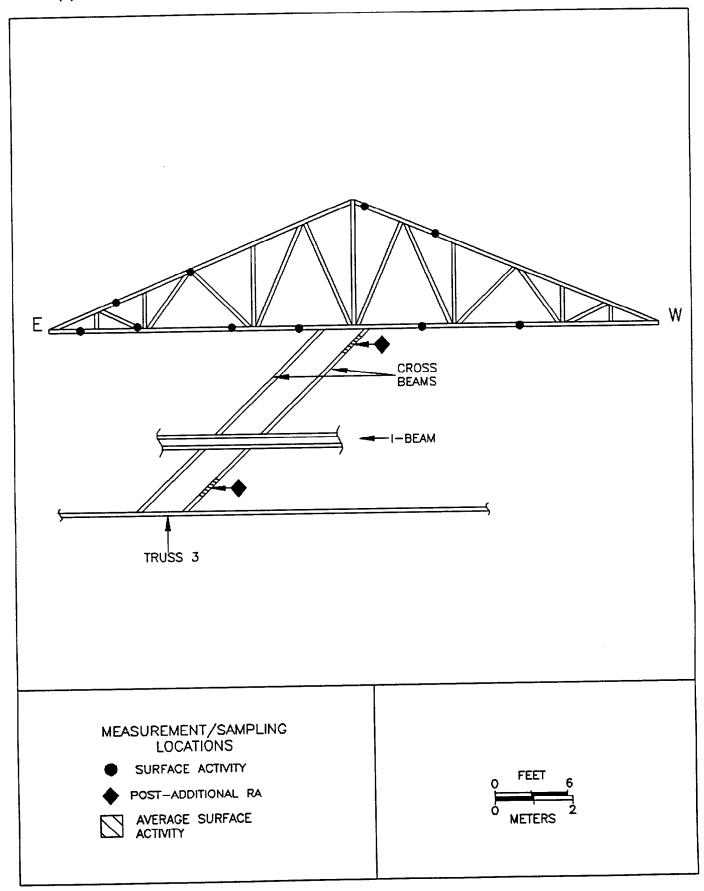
Building 3, Truss 2 — Measurement and Sampling Locations
